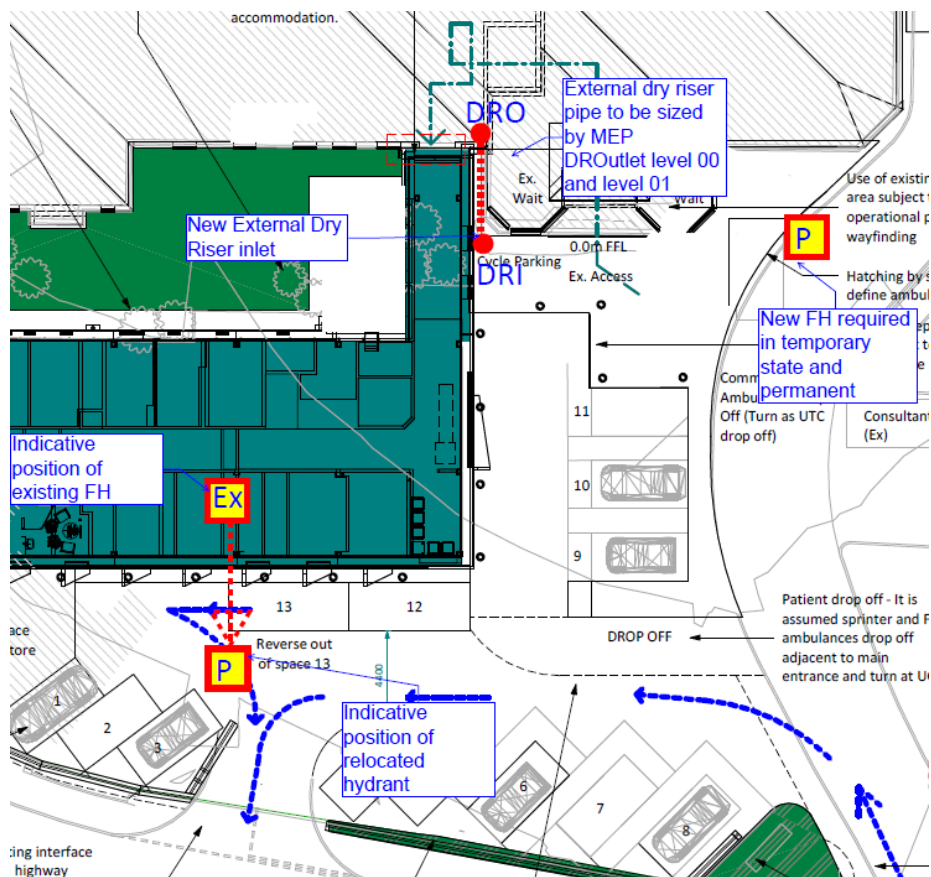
Works to relocate existing hydrant and overview of the Dry Riser system
